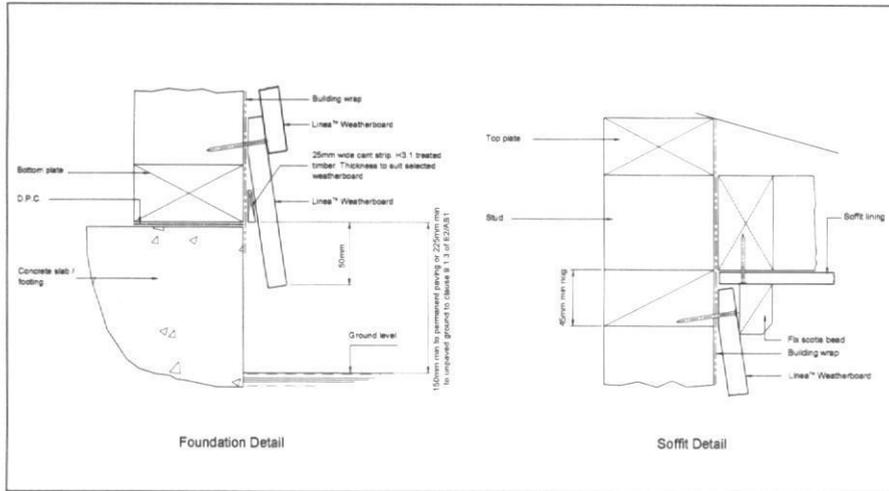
DIRECT FIX CONCRETE SLAB AND SOFFIT
